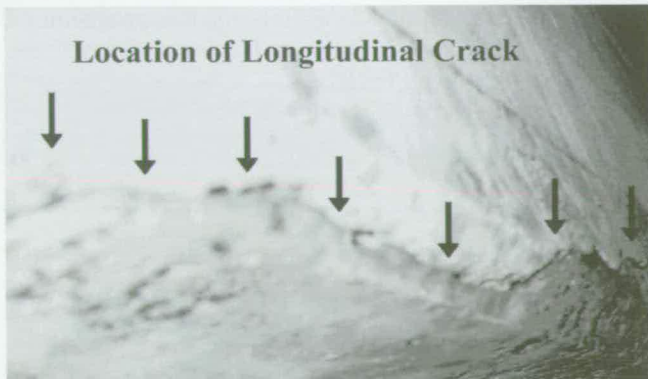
Cracking at east end along base and north side of concrete beam.
